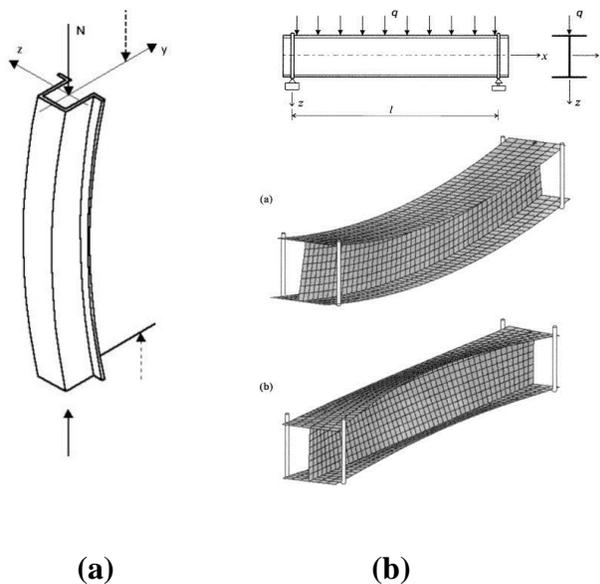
Failure modes of column and beam: (a) Flexure buckling (*Katedra za metalnekonstrukcije, 2012*); (b) Lateral-torsional (*Ákos Sapkás, László P. Kollár, 2002*).
